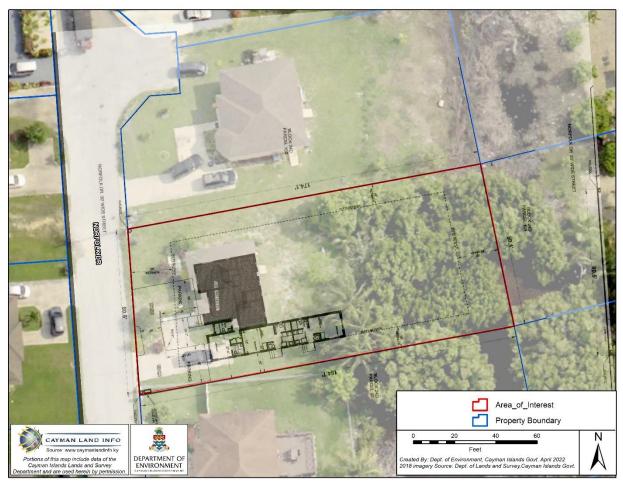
Site Plan Overlaid onto LIS 2018 Aerial Imagery (Plan source: Velasques & Asco. Architecture Design Concepts, October 2021)
